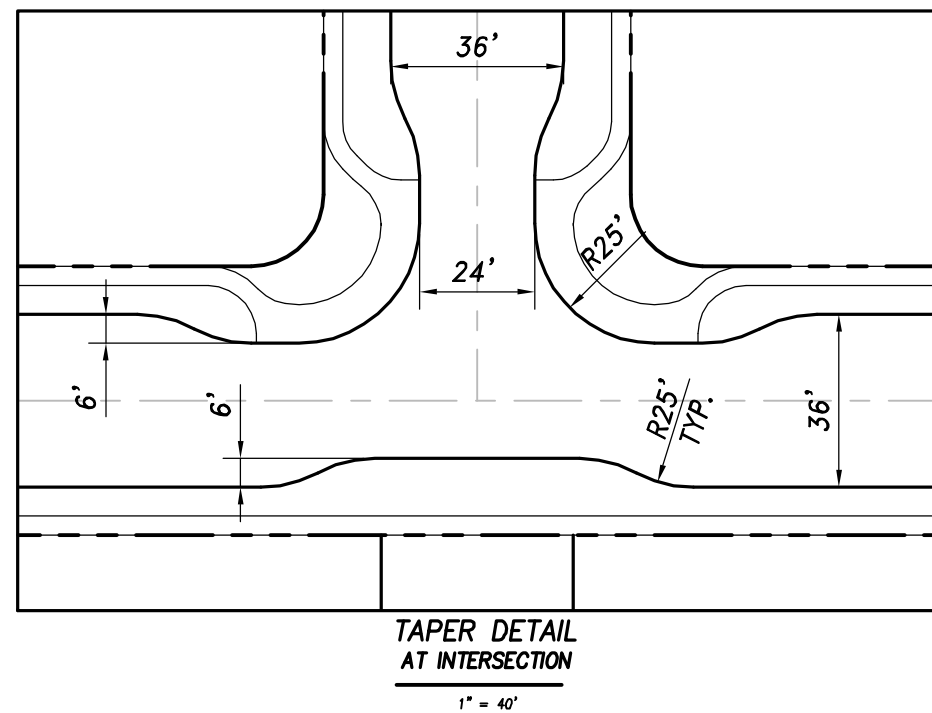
19th Street and North Bluff Road Entry and Off-Site Improvements
